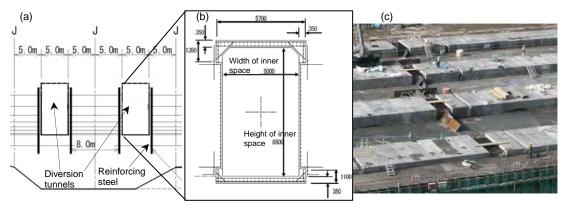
Cross section and precast concrete material used for the temporary diversion tunnels: (a) spacing between the tunnels, (b) precast concrete material used for the top and bottom of the tunnels, and (c) placing precast concrete materials at the top of the tunnels.
